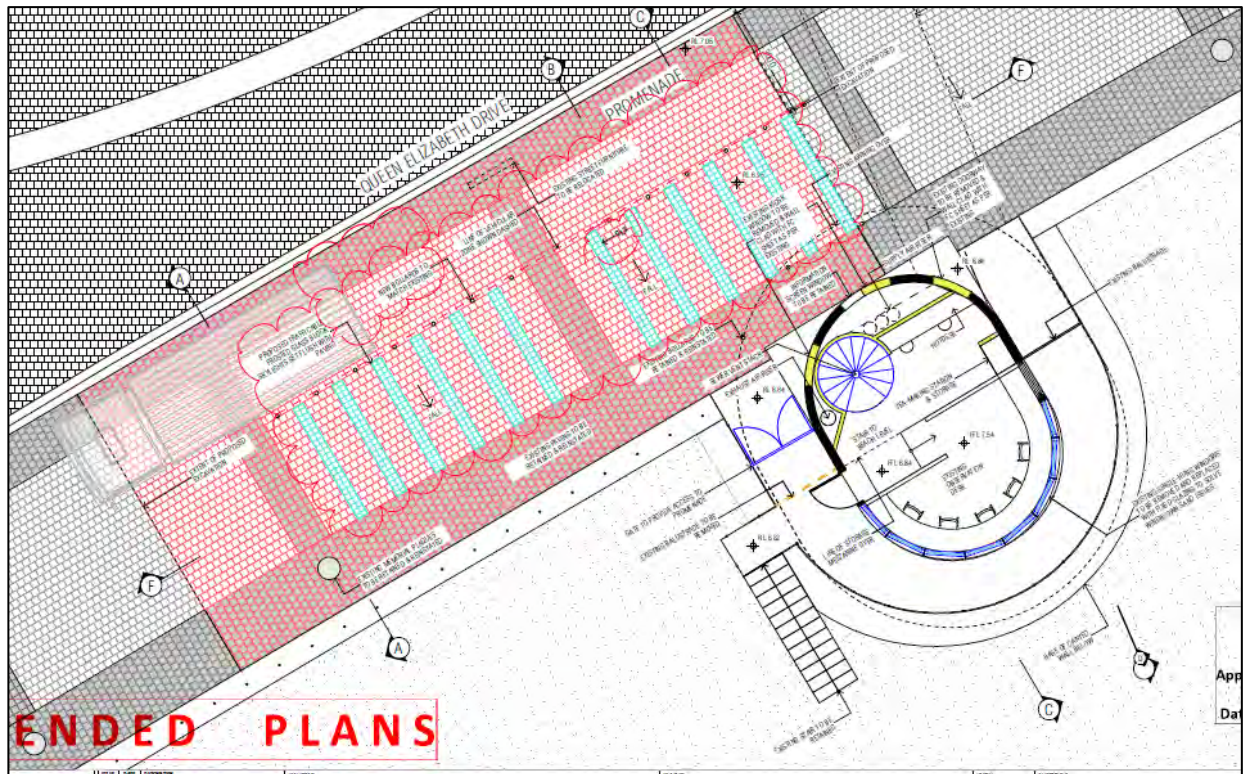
Approved beach level floor plan of Lifeguard Tower, Tunnel 2 and Amenities block.
